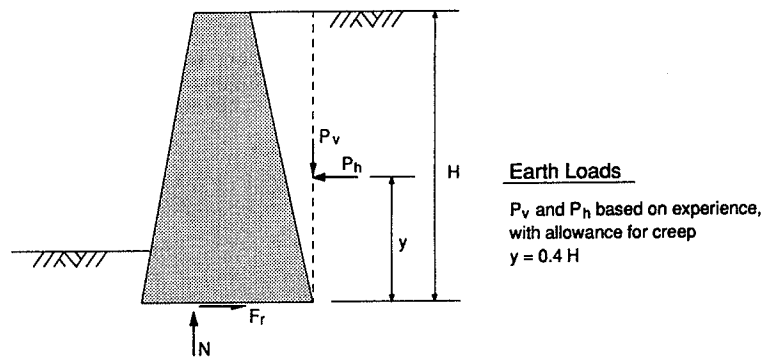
Earth Loads and Stability Criteria for Walls with Clayey Soils in the Backfill or Foundation (After Duncan et al., 1990)
